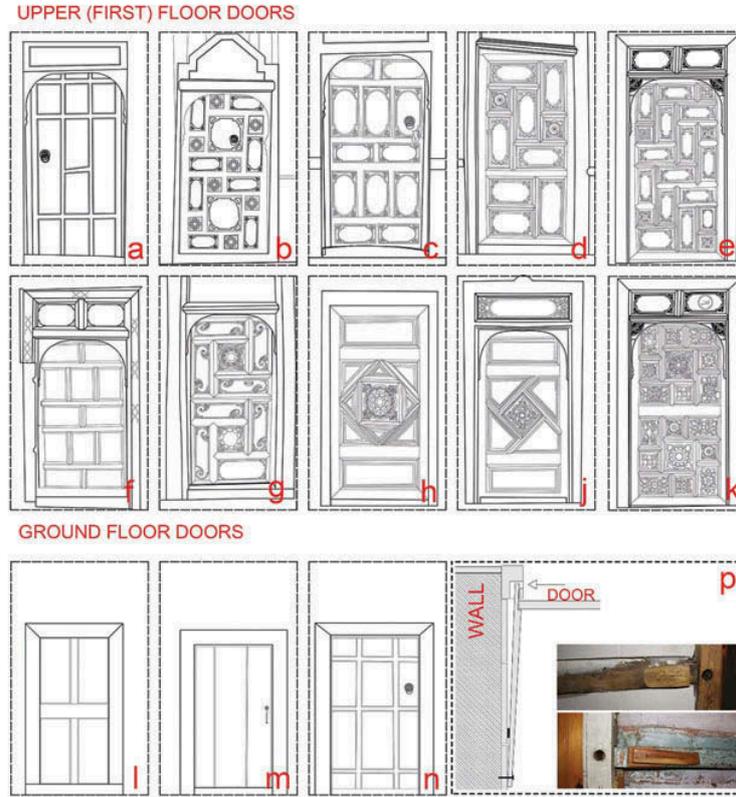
The typology of the second floor doors (a,b,c,d,e,f,g,h,j,k), ground floor doors (l,m,n), and the “traka-tıfraz” system used on interior doors (p) in the Bucakalan village.
